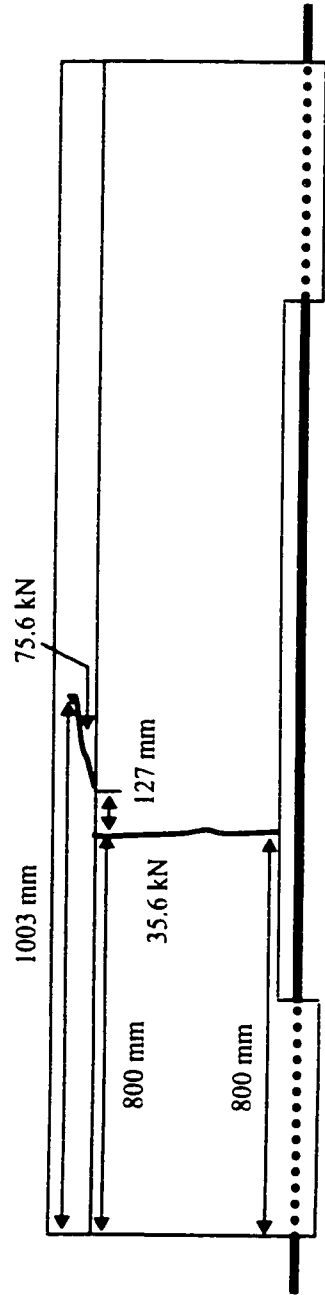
Crack pattern of beam D1-D9.70-B18C
